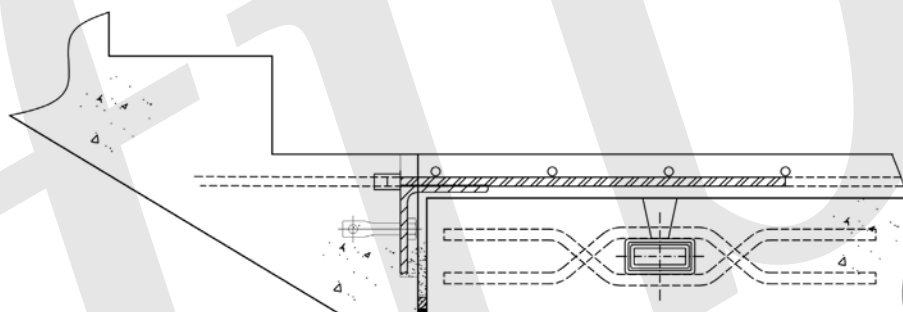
Section through tie connection between flight, landing and wall using a structural topping. The transverse reinforcement in the topping is continuous into the side walls, the longitudinal reinforcement in the topping is coupled with the landing reinforcement.
